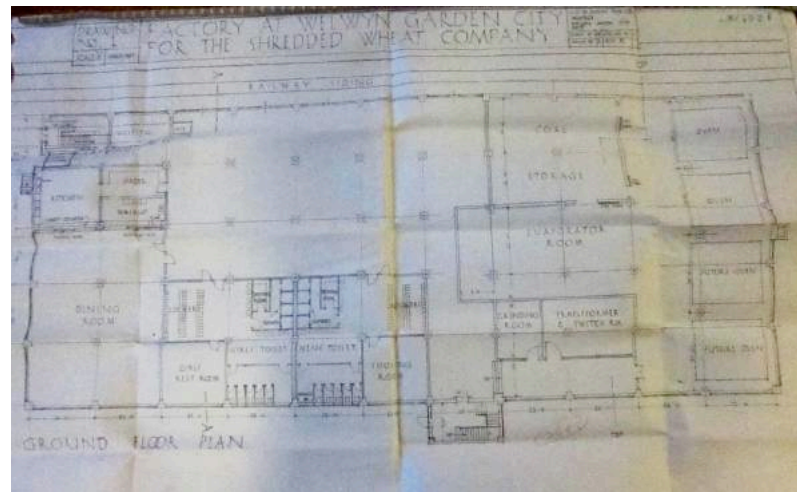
and 15: Ground and first floor plan of the original factory building.
